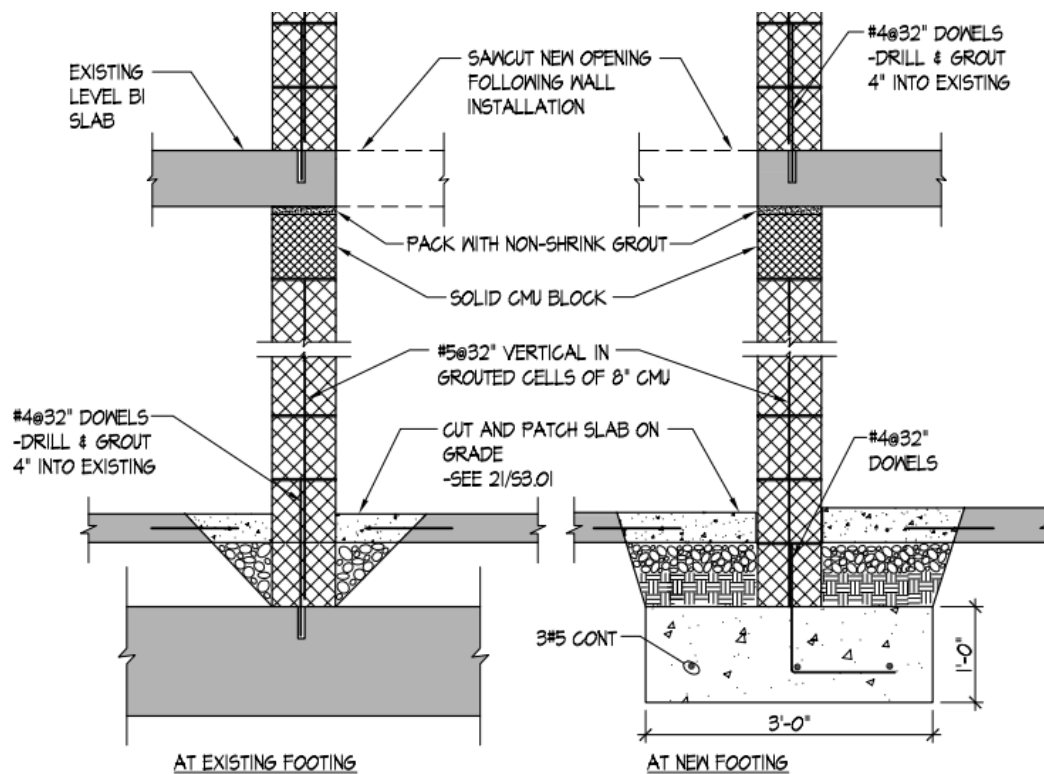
Section through new Load-Bearing CMU Walls. Existing slab was cut to allow walls to bear on existing footings.
